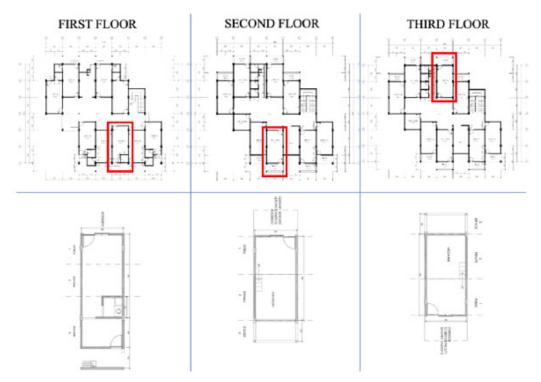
Layout Plans and Units on First, Second, and Third Floor (Source: Aryani, 2022)
